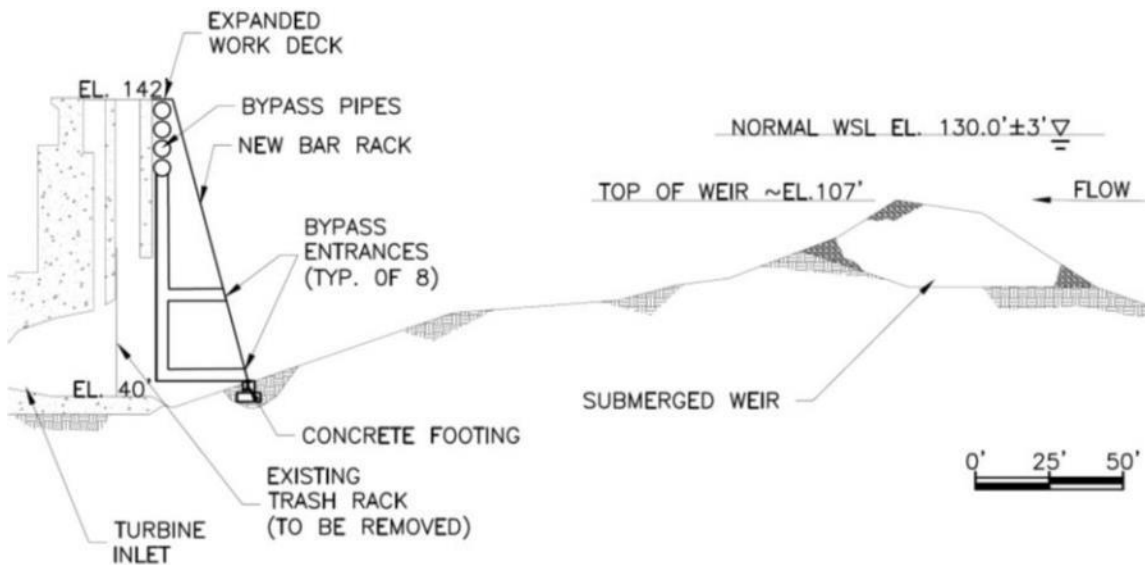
Conceptual design of new bar rack alternative installed at the Roanoke Rapids intake (section view).
